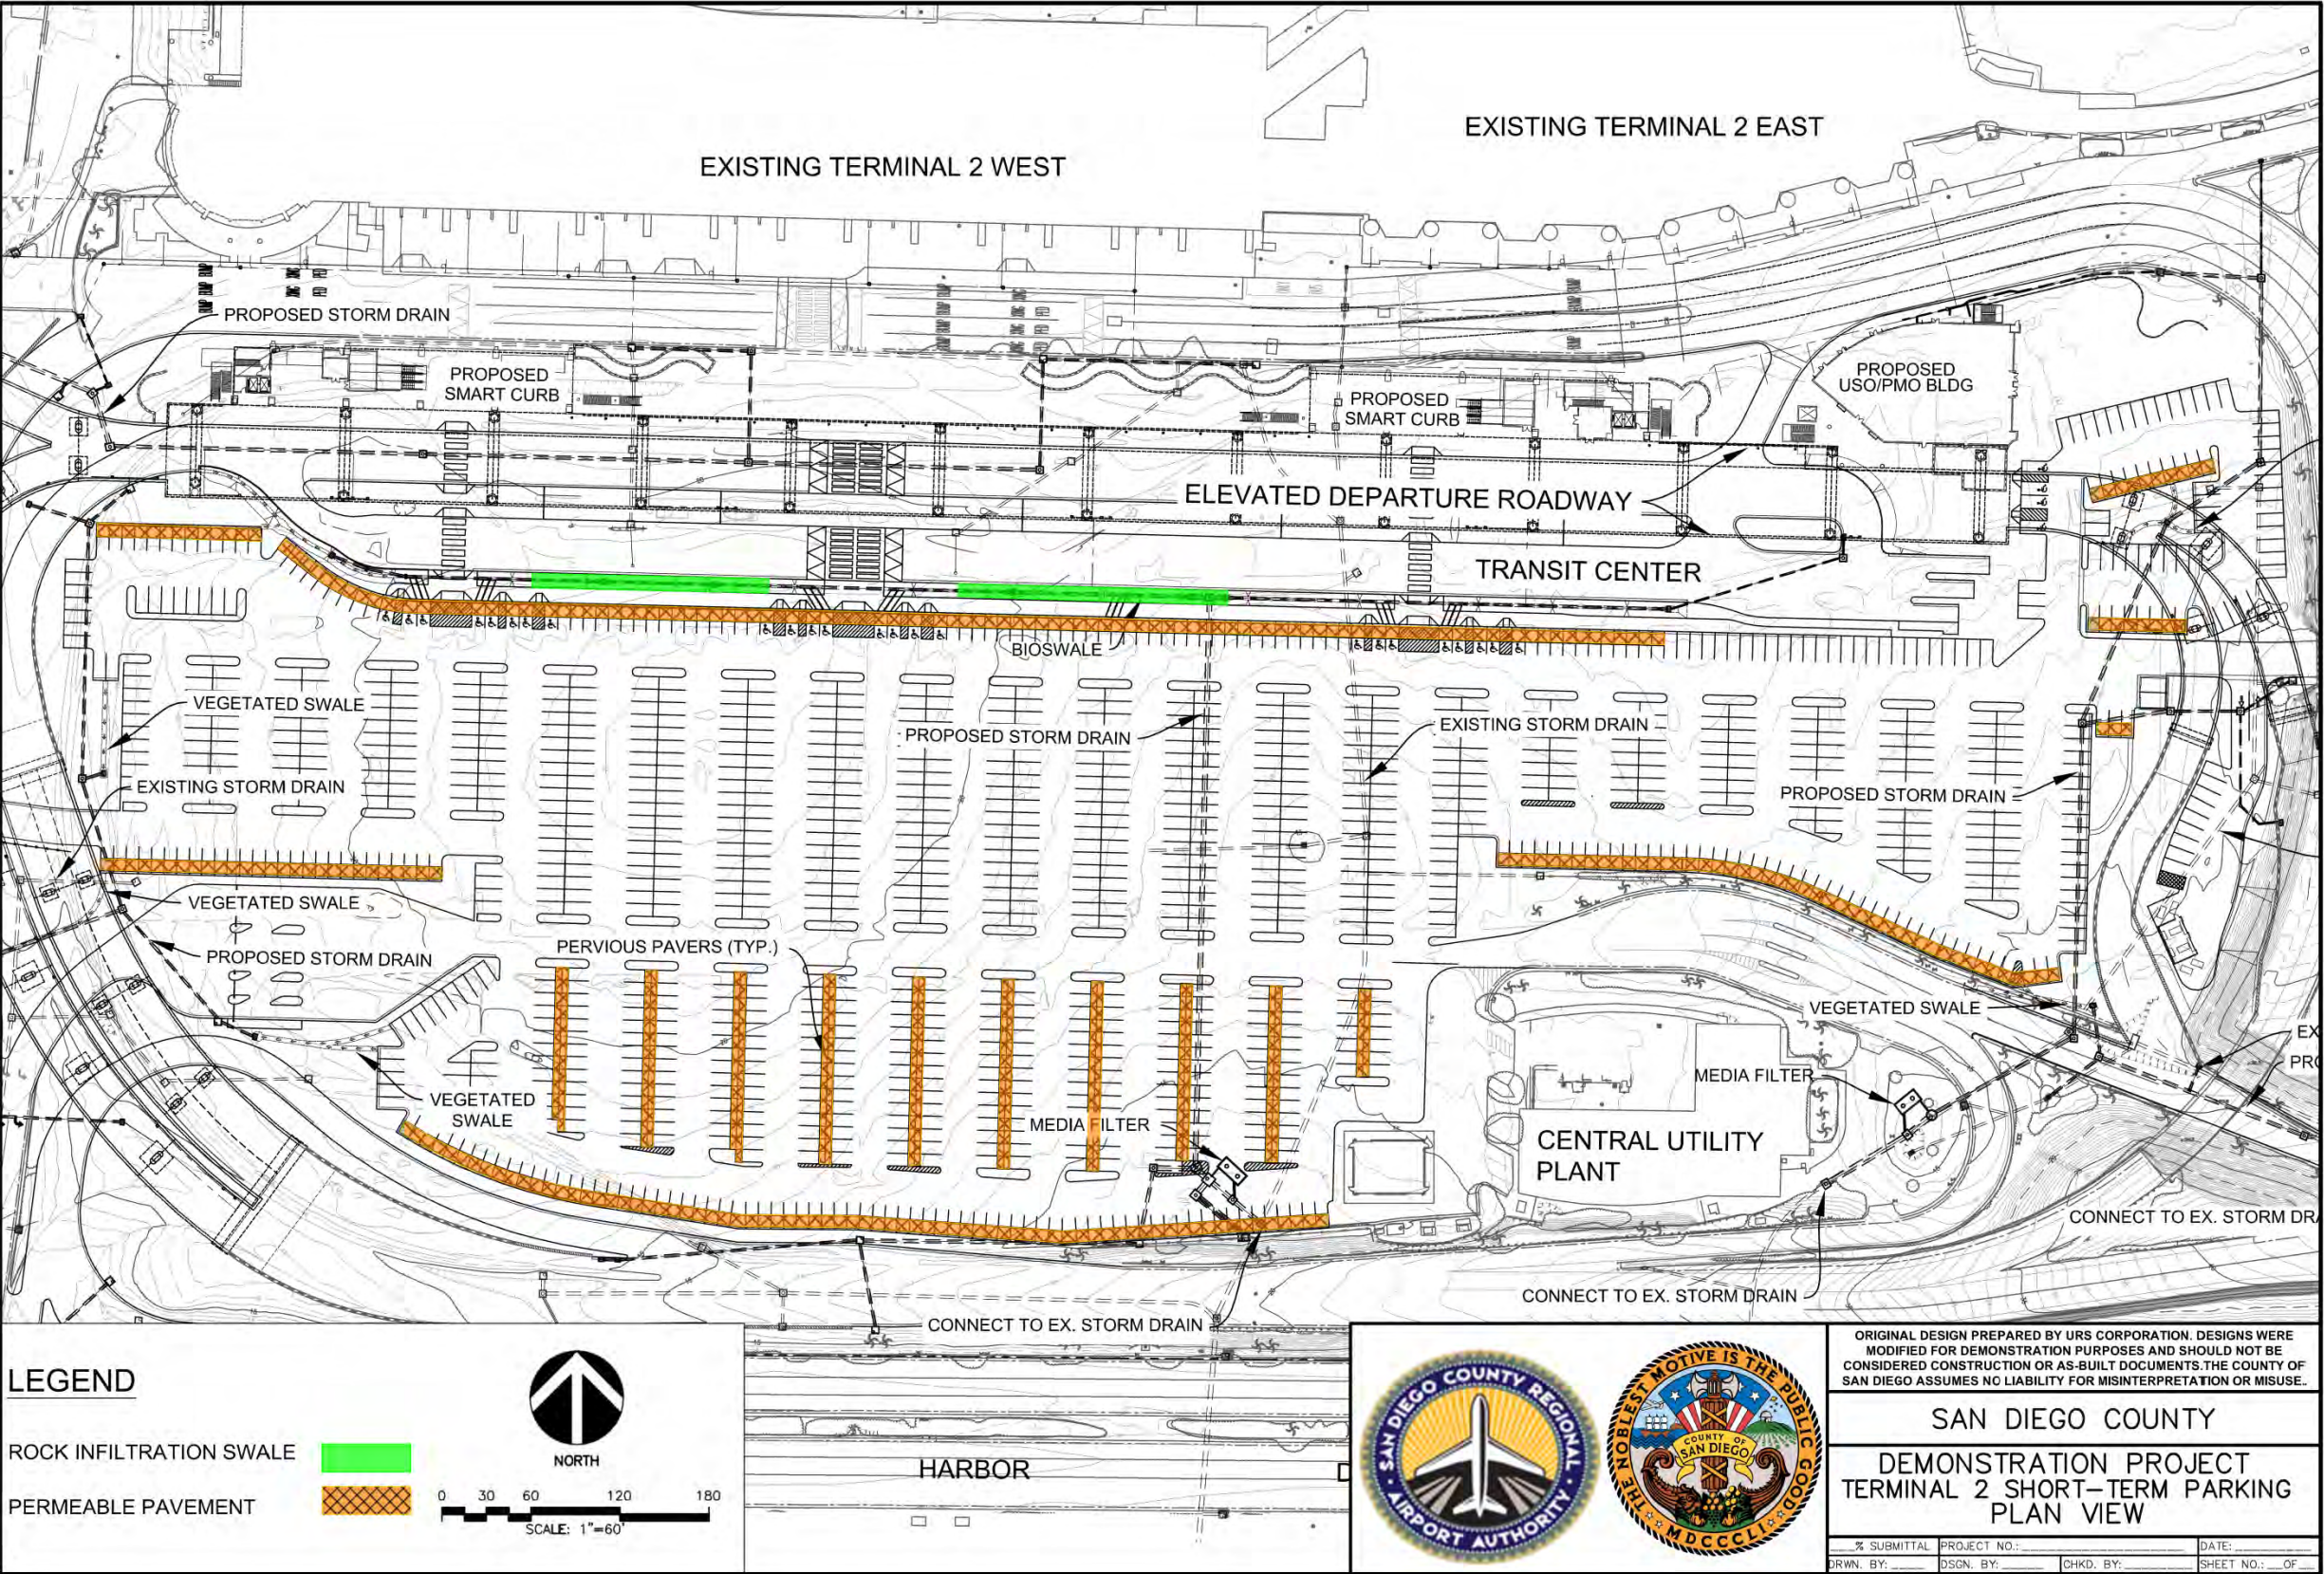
PICP was chosen as the surface course for this application. Bedding and joint fill material consists of washed ASTM No. 8.
